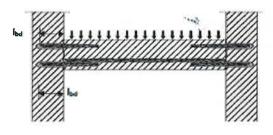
End anchoring of slabs or beams, designed as simply supported
